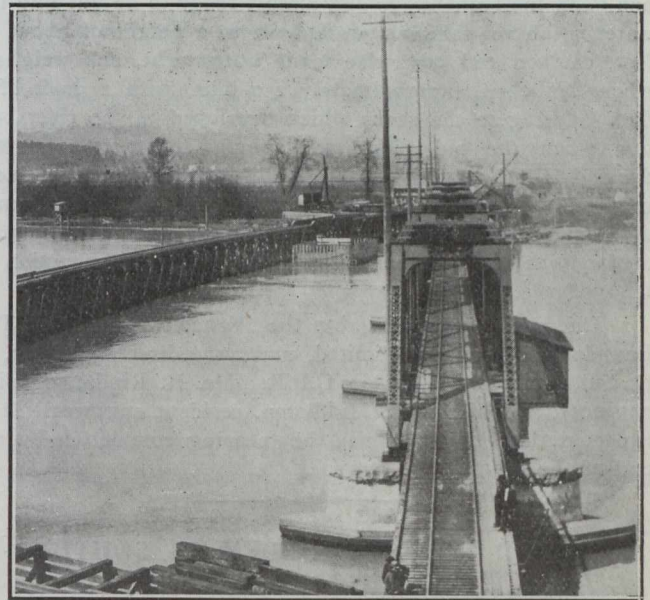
C.P.R. Pitt River Bridge, Showing Western Portion of Main Trestle.
